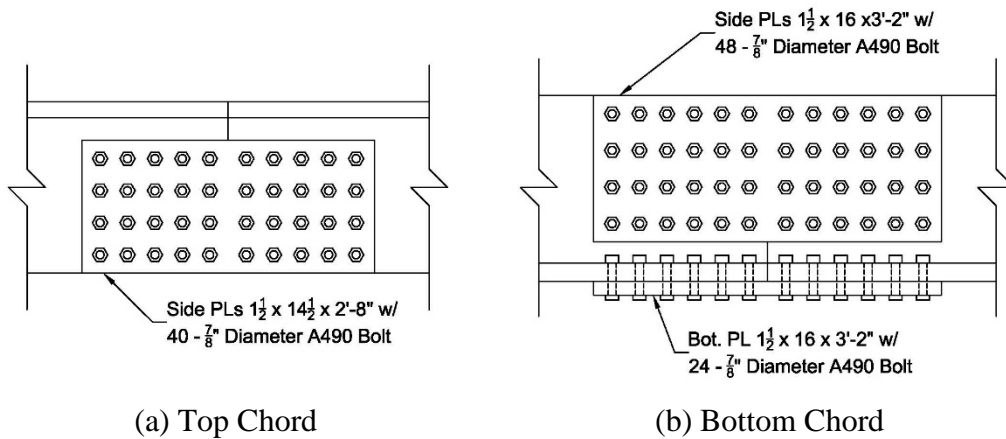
Splice Connection Details for the Single-Splice in Truss 1
